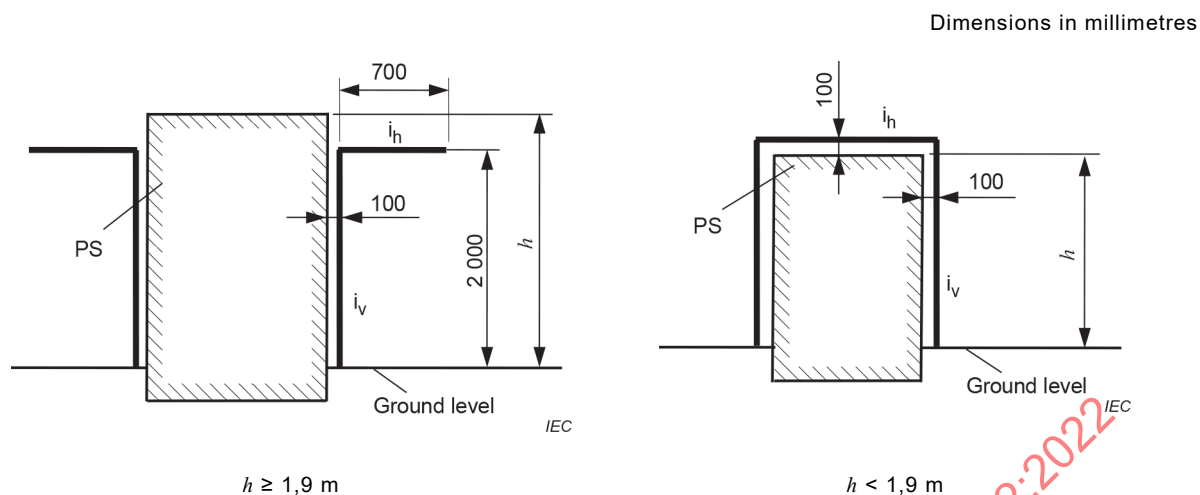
e – Protection of general public around a prefabricated substation (closed doors)
